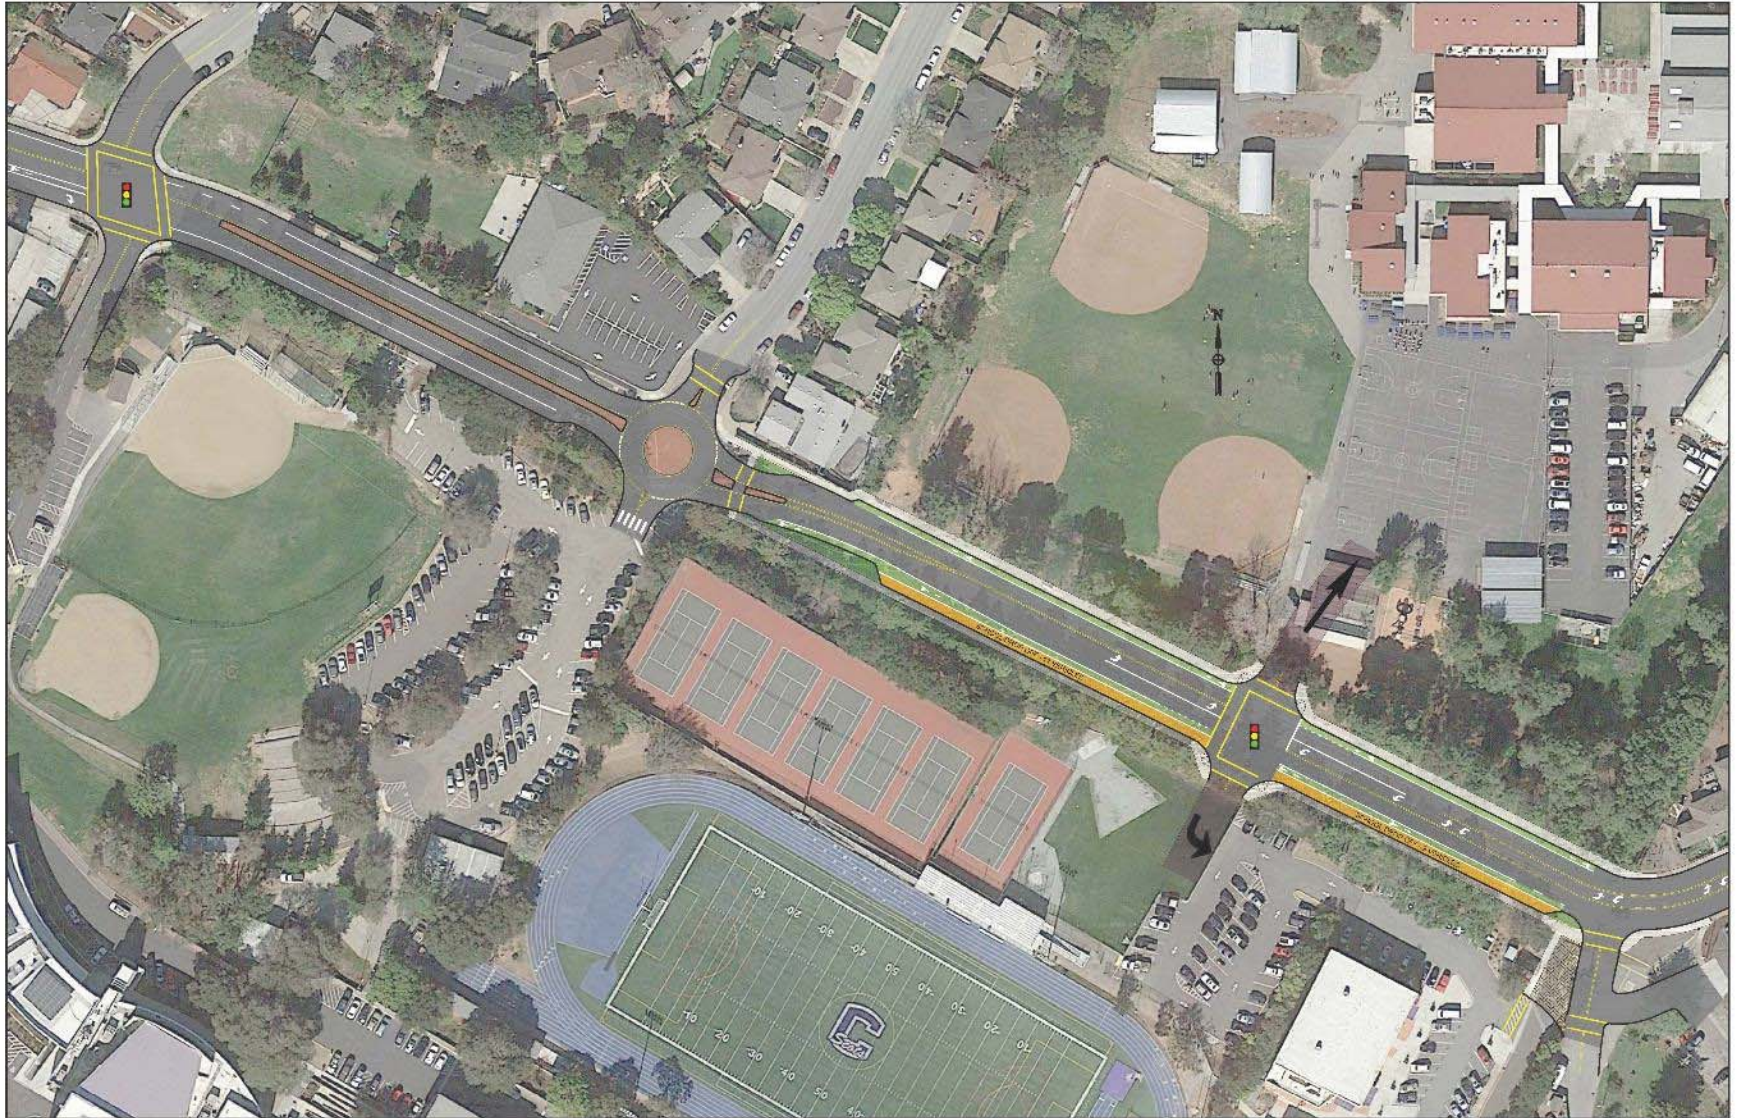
Alameda de las Pulgas/San Carlos Avenue Corridor Plan
